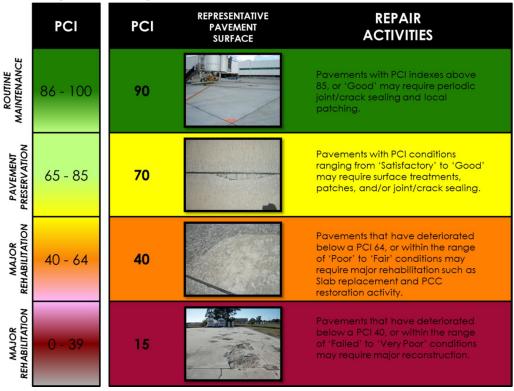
Rigid Pavement, Portland Cement Concrete
